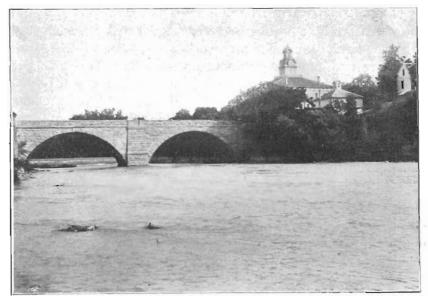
Stone bridge at Elkader; built of Galena limestone.
